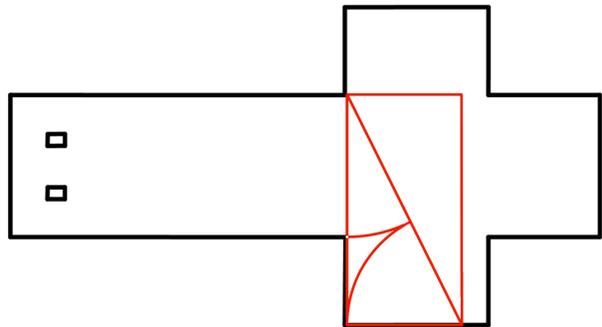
Geometric construction to verify golden ratio in Sta. Barbara Church floorplan.
